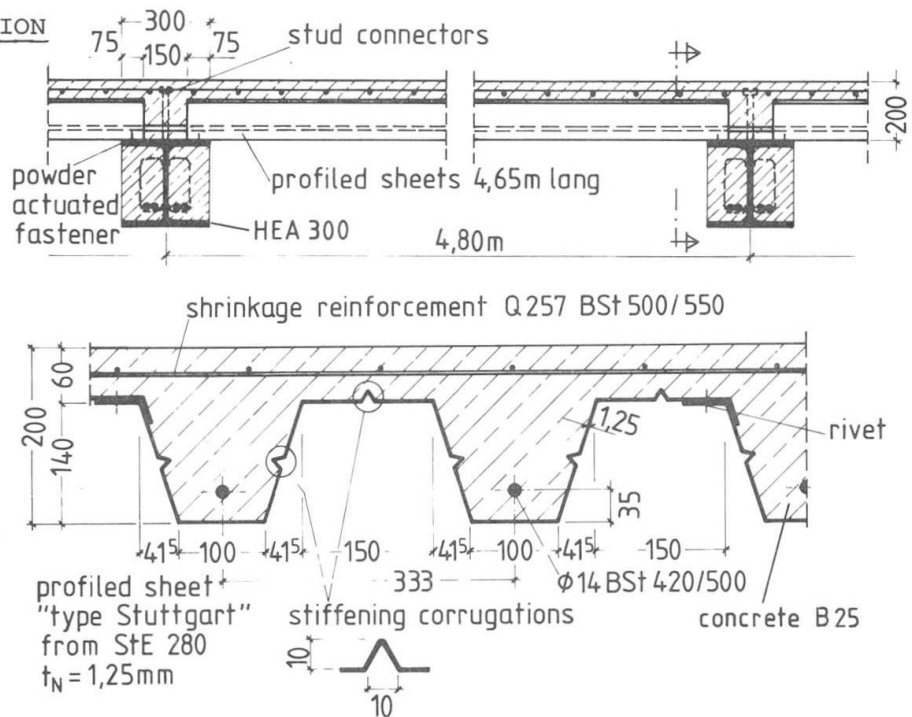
Sheet-supported reinforced concrete slab in demo-building
